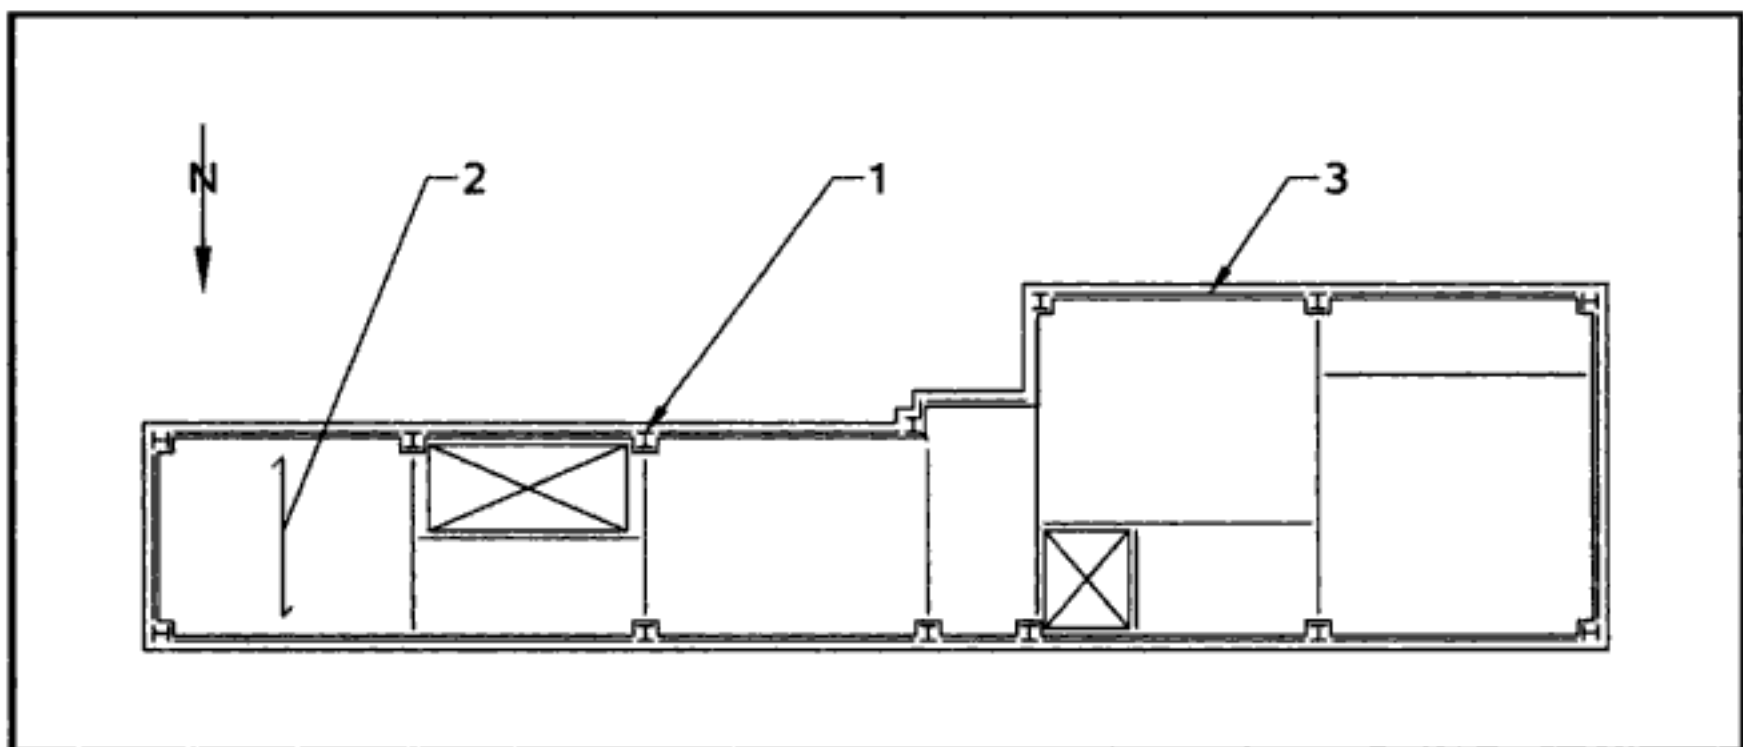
Typical floor framing plan, 953 Fifth Avenue. 1 is a spandrel column in a masonry pier, 2 is the typical floor slab, and 3 is a typical spandrel beam embedded in the wall.
